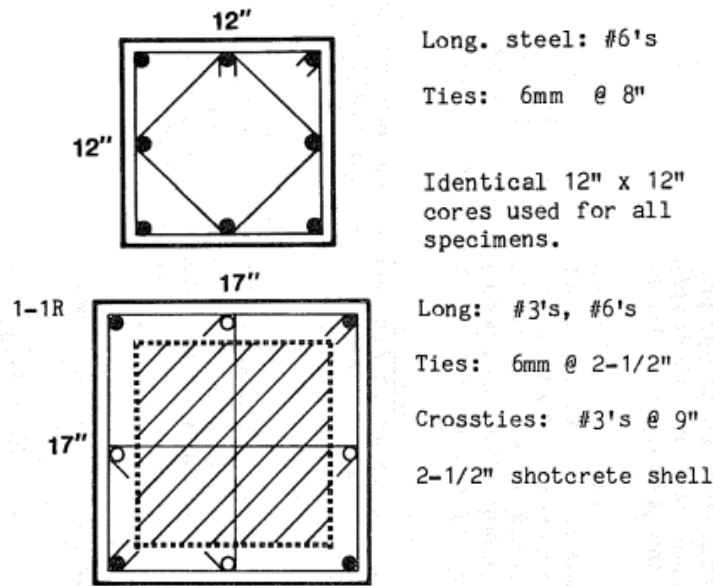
Cross Section of the 1-1R and image of the bars for jacking (Bett, 1985)
